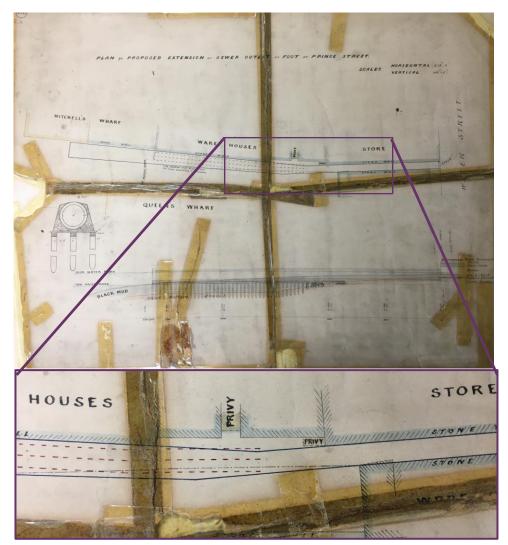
A plan (top) and detail (bottom) showing a proposed sewer extension (red dotted lines) along the north edge of Albro's brick warehouse. ²⁴ Note the two privies and unidentified building between Albro's warehouse ("houses," left) and Robertson's Hardware ("store," right). North is to the bottom.
